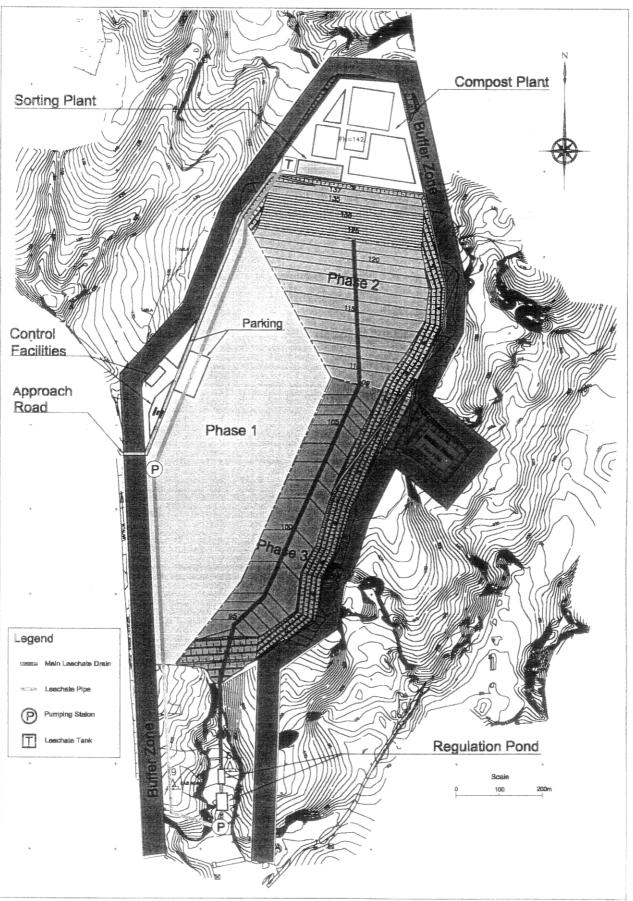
Proposed Medical Waste Disposal Site in Sofulu
